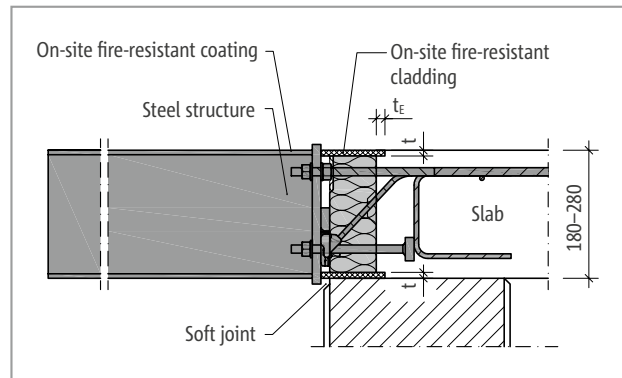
Schöck Isokorb® T type SK: On-site fire-resistant cladding of the connection when using steel structures with fire-resistant coating: Cross section
